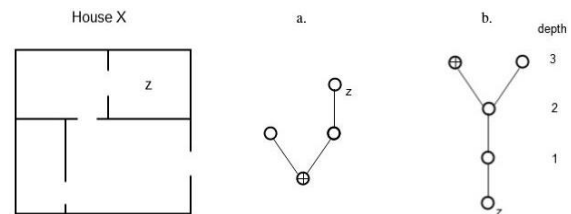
Plan of house X a) showing planning b) space planning with depth
